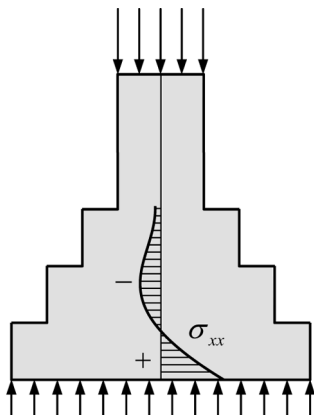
Foundation block. Stresses and strut-and-tie scheme.
